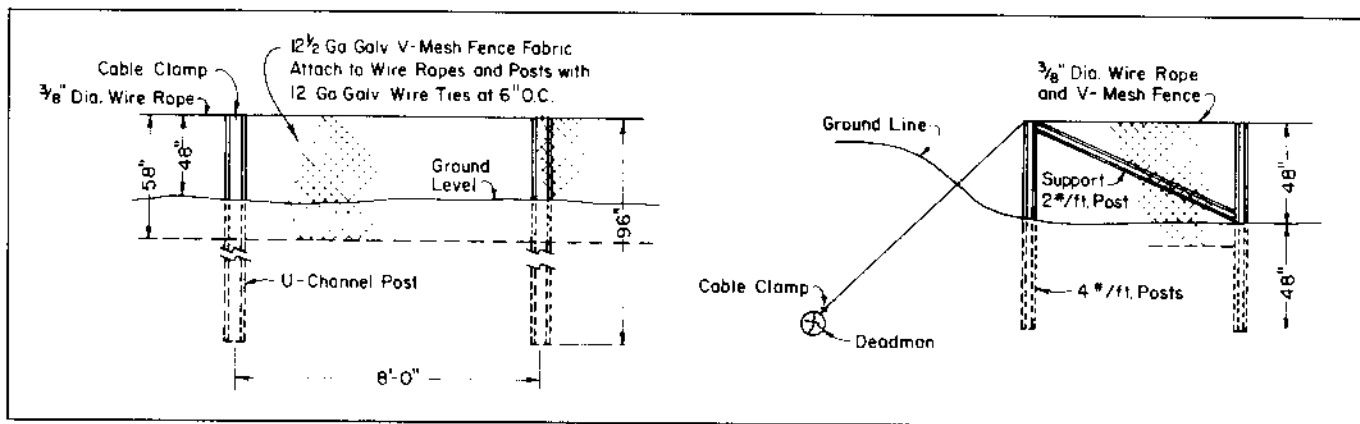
Details of main revetment and baffle sections and the deadman and support assembly.
